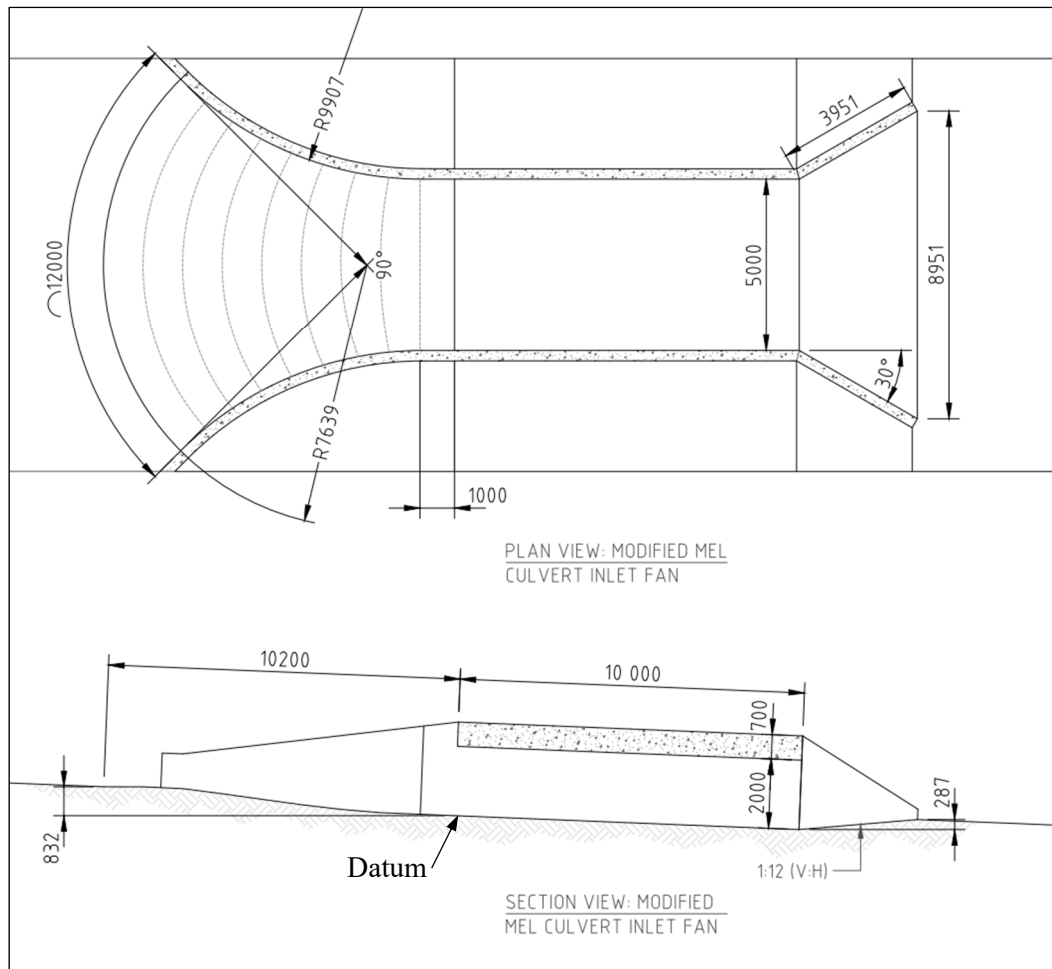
Modified MEL culvert design drawings, 90° inlet fan.
